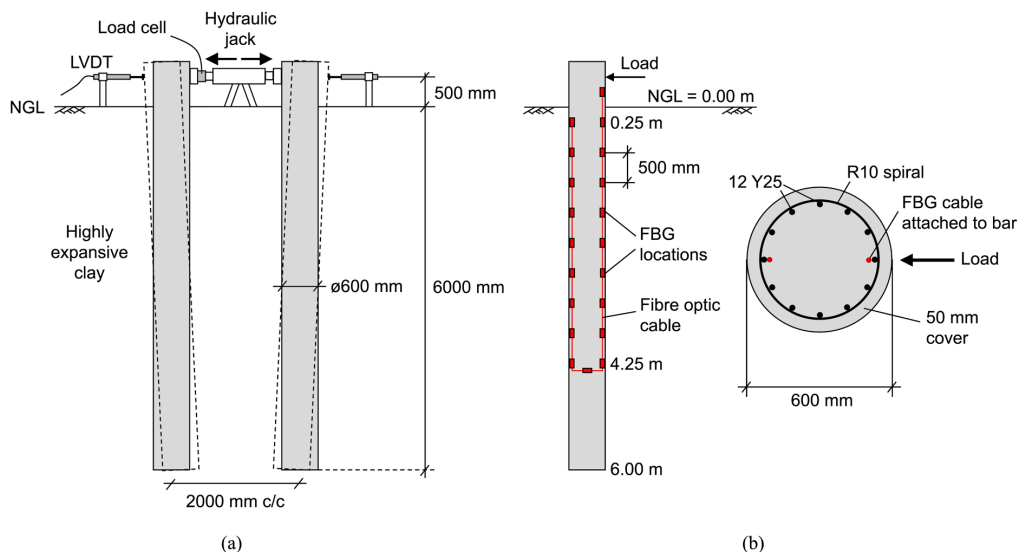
Experimental setup and instrumentation for lateral pile loading tests: (a) loading setup; (b) strain gauge layout and section details.
